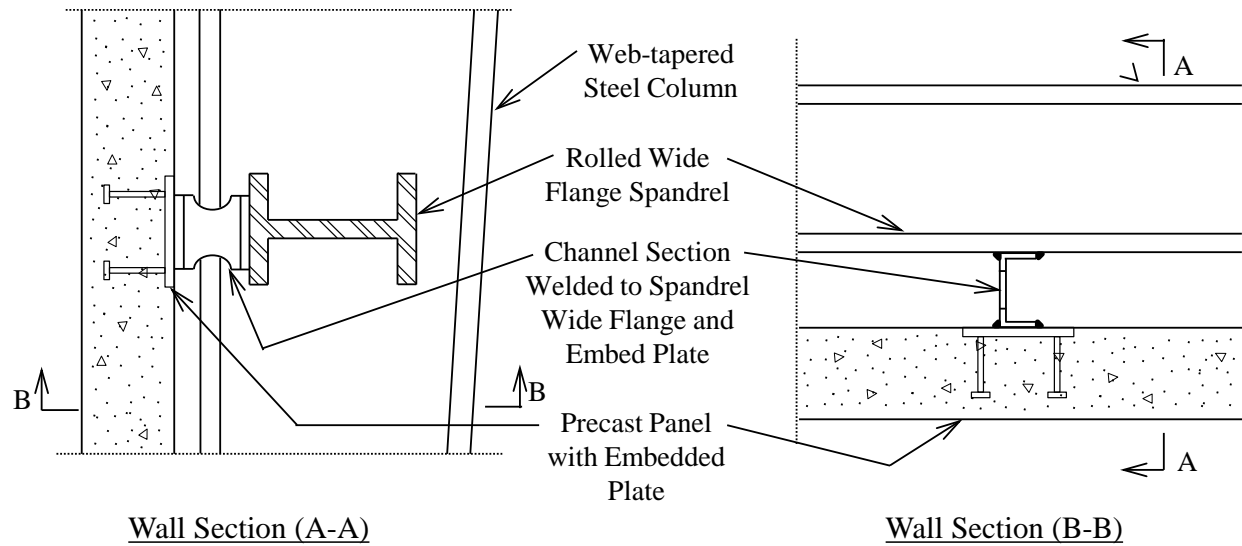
Prototype Tapered Yielding Connection in Metal Building System Hard Walls
